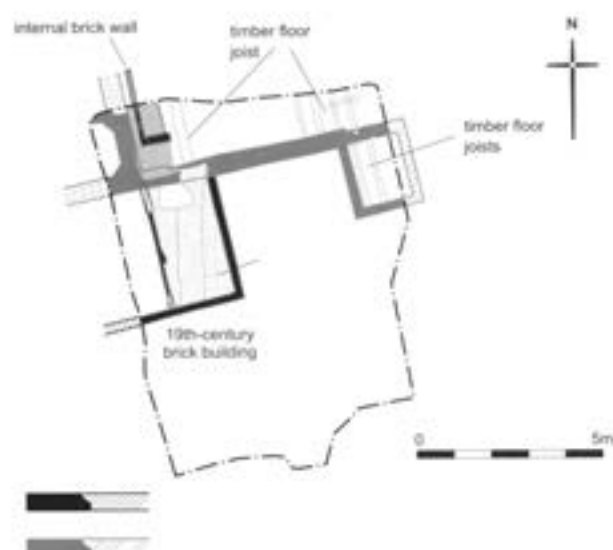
Church Lane/Church Street, Dagenham. Plan of the principal 19th-century developments in trench 3
